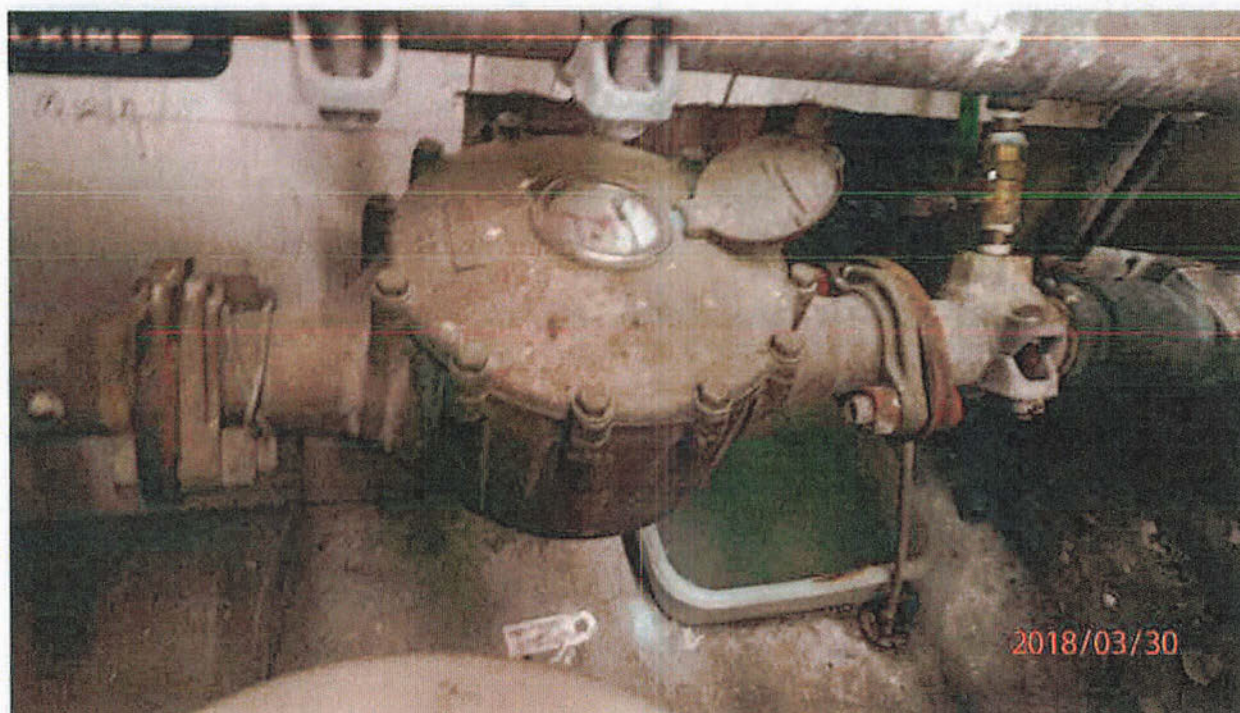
Looking south at the well house water supply on west side of office building. Waypoint 26.	14
